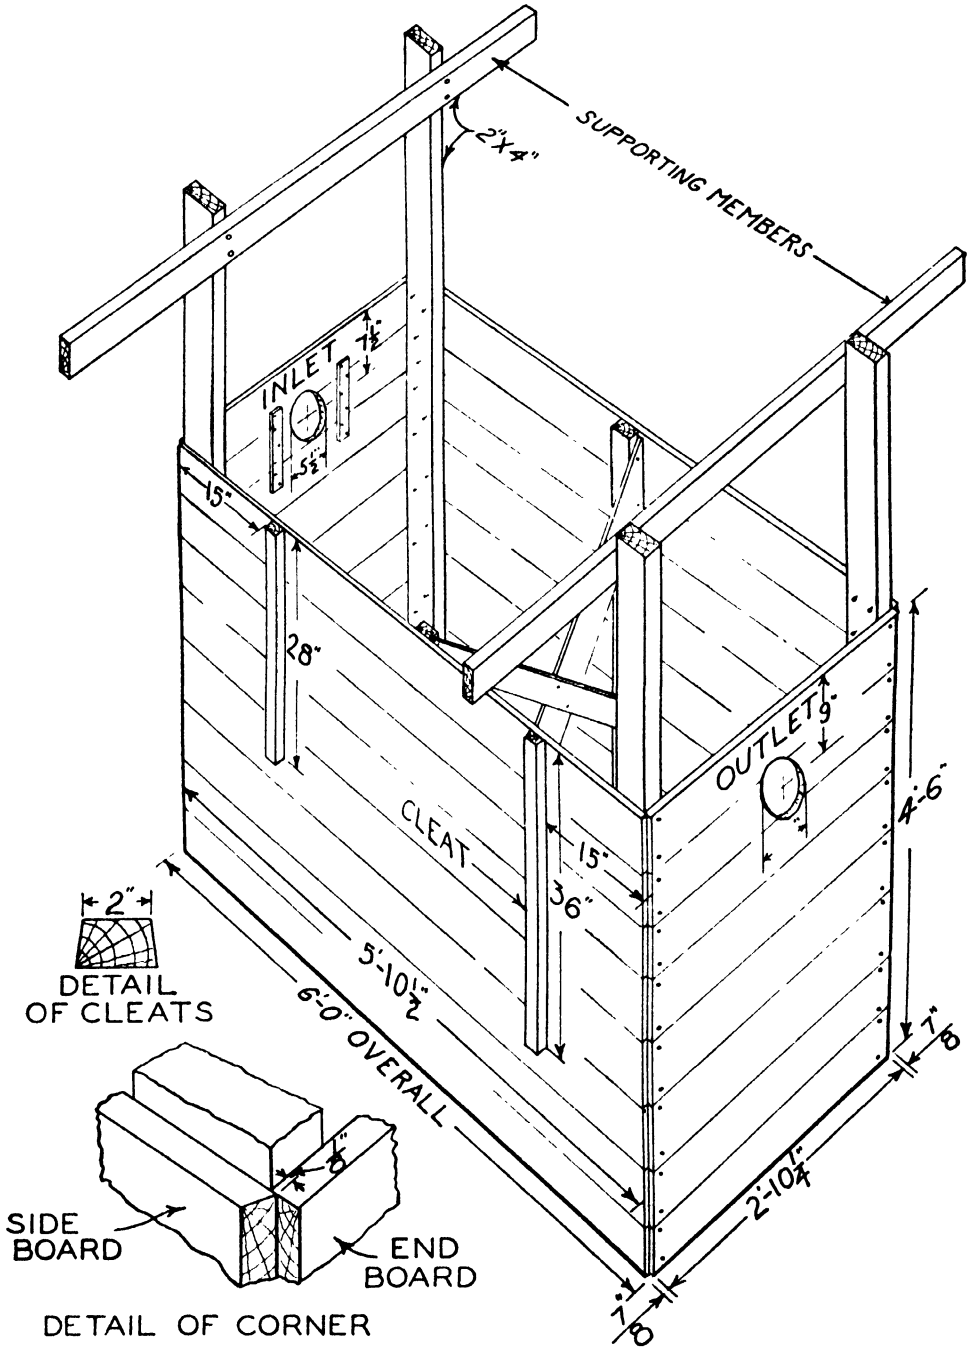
Working drawing for the inside form of a septic tank showing the form ready to be placed in the pit. The 2 x 4's at the top of the corner posts are for supporting the form upon posts P, shown in Fig. 19-4. They should not be nailed in place until the pit is ready for the form.
